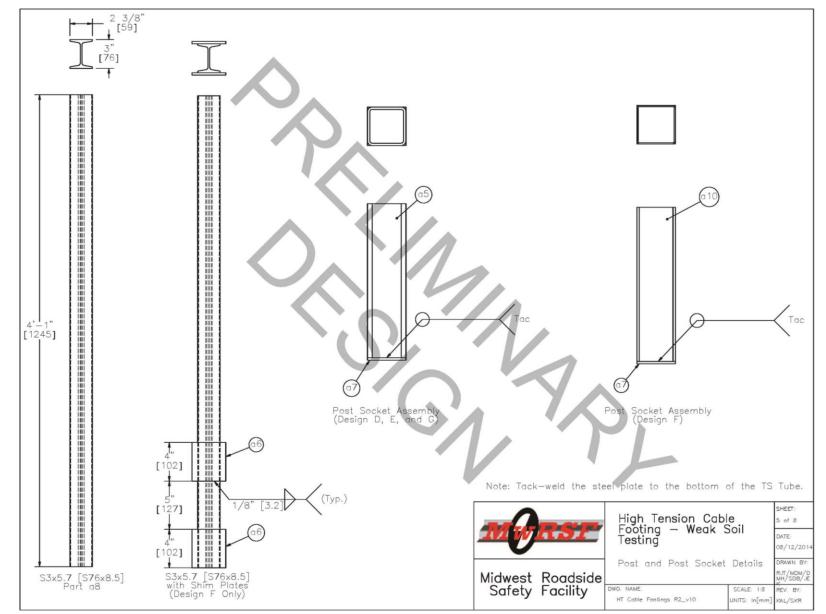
Steel Post and Socket Details, Test Nos. HTCB-5 through HTCB-9
